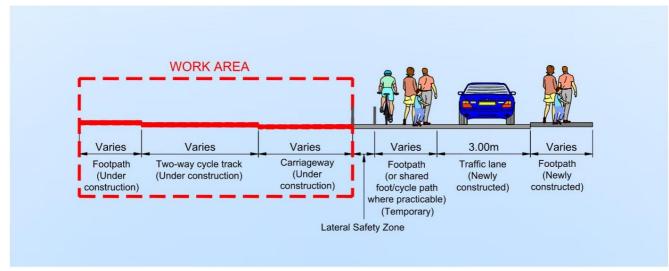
Traffic Management Cross Section, Section 5d – Stage 2
